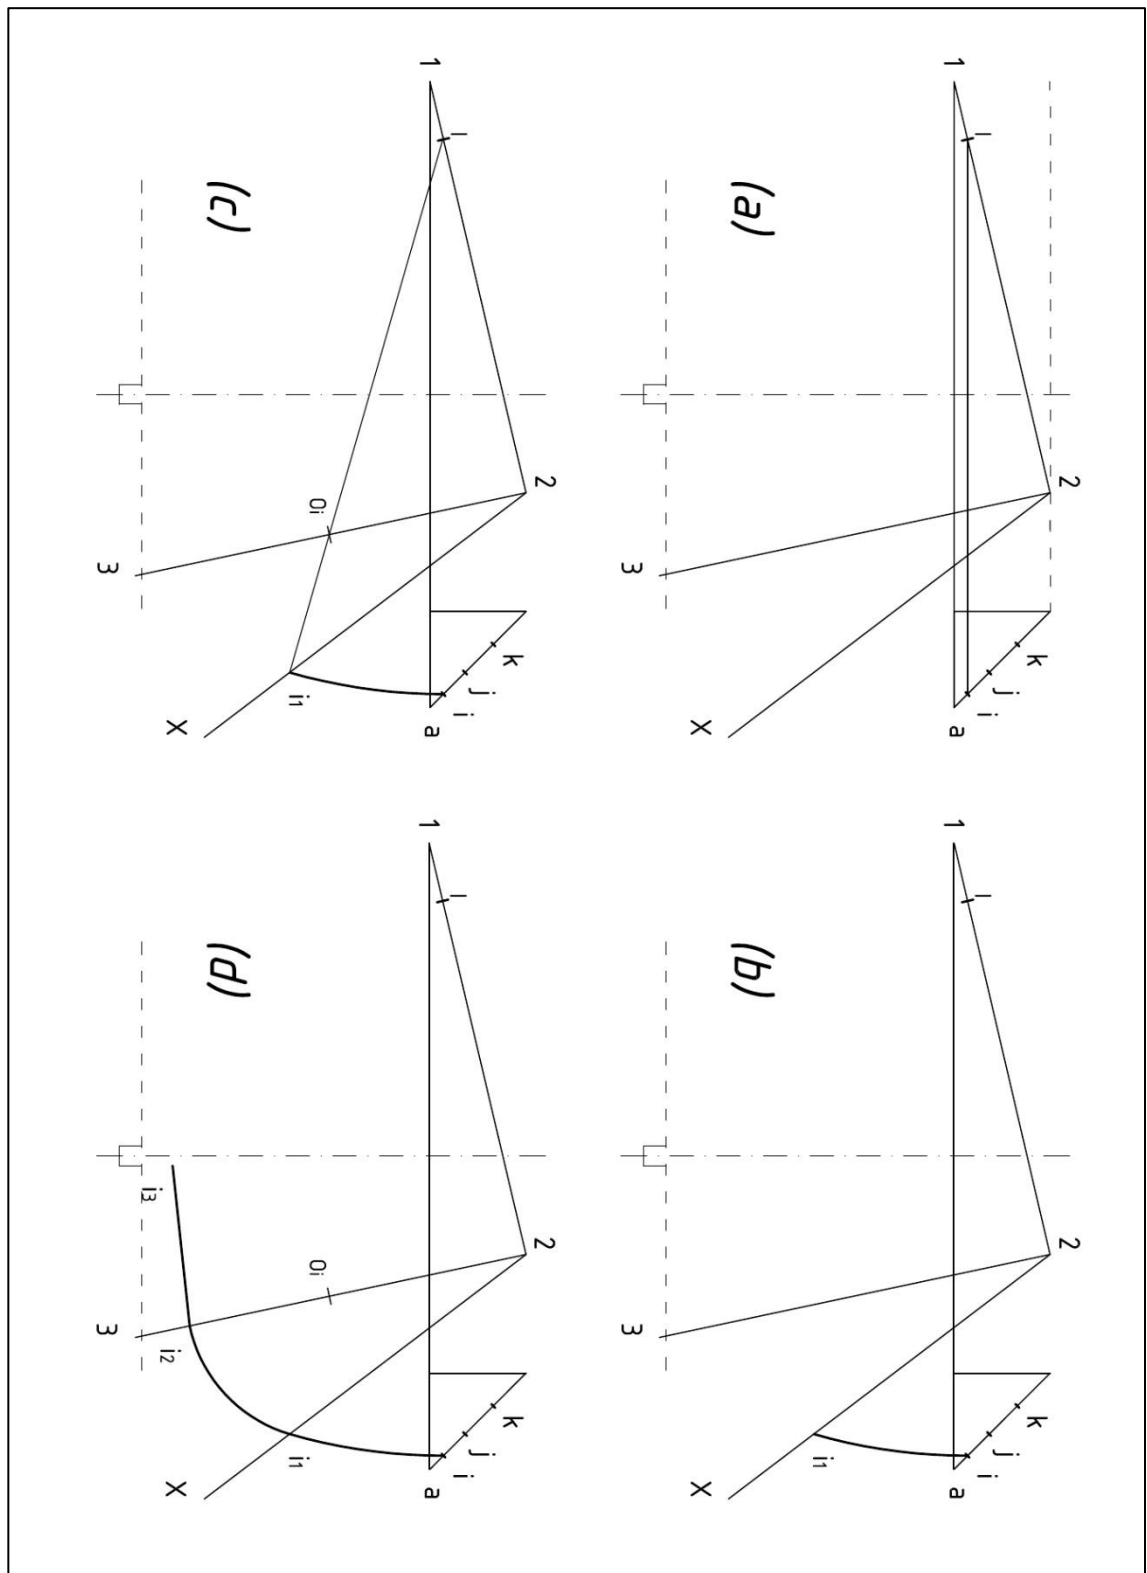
Arrospe's method of drawing *section-i* from the quadrant. (Drawing JPO)
